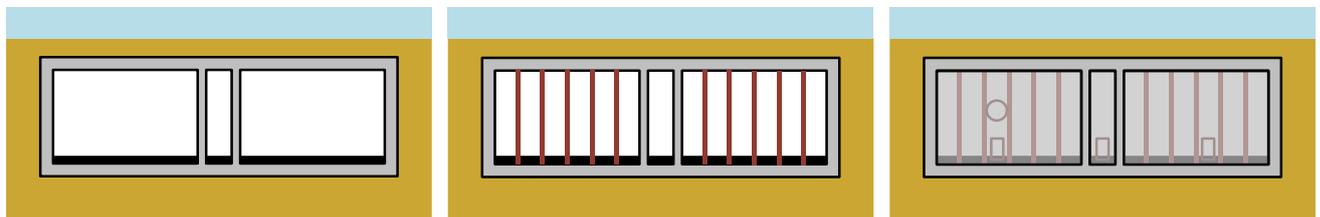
, BULKHEAD CONSTRUCTION PHASING; CROSS-SECTIONAL VIEW
